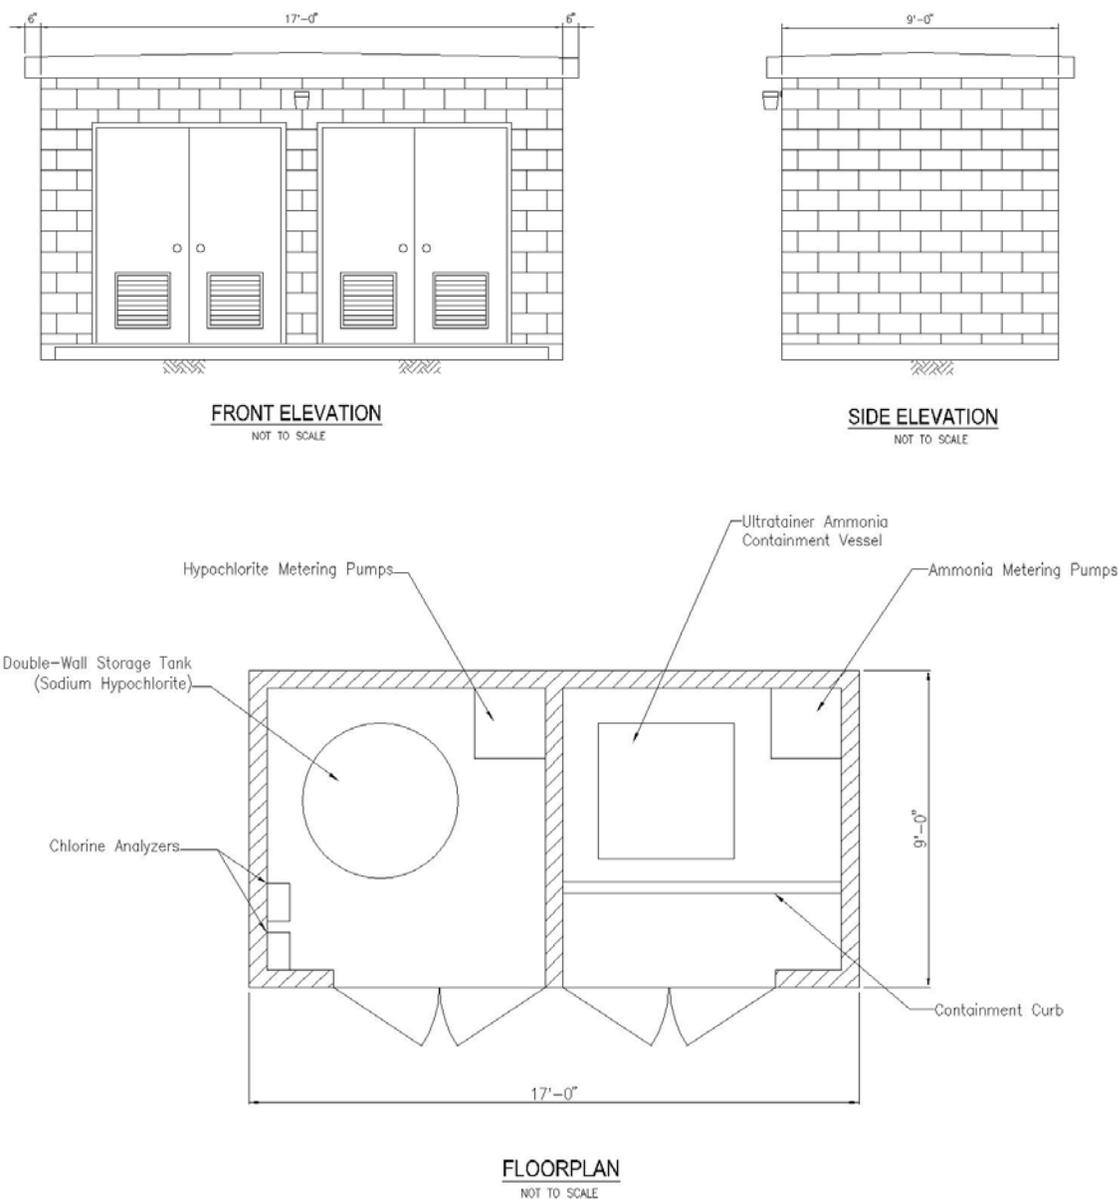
Proposed Chloramination Building Layout (Sundale)
